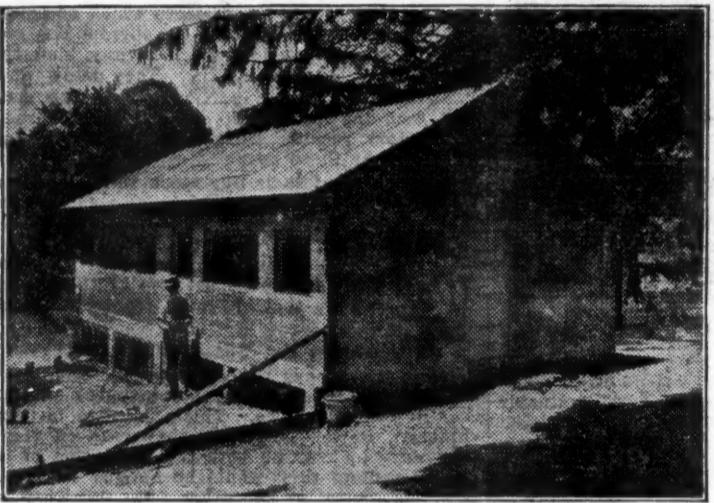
A Concrete Poultry House.—This Building Rests on Concrete Piers and Has a Concrete Floor, Partition and Walls. The Walls Are Only Four Inches Thick.
